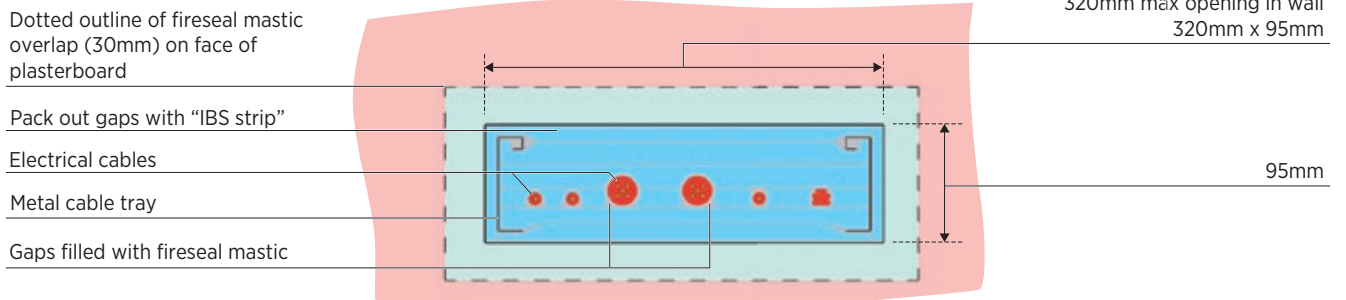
Penetration Detail – Cable Tray – Section Through Tray
